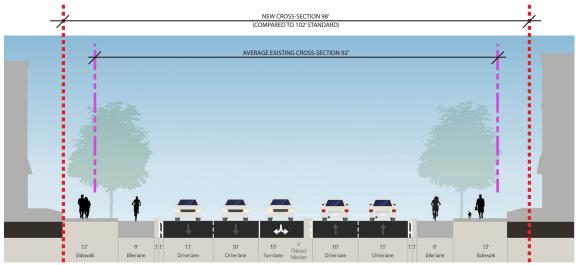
Planning for Redevelopment Cross Section: A cross-section of the Recommended Design that plans for redevelopment between City Park Avenue and Shields Street.
